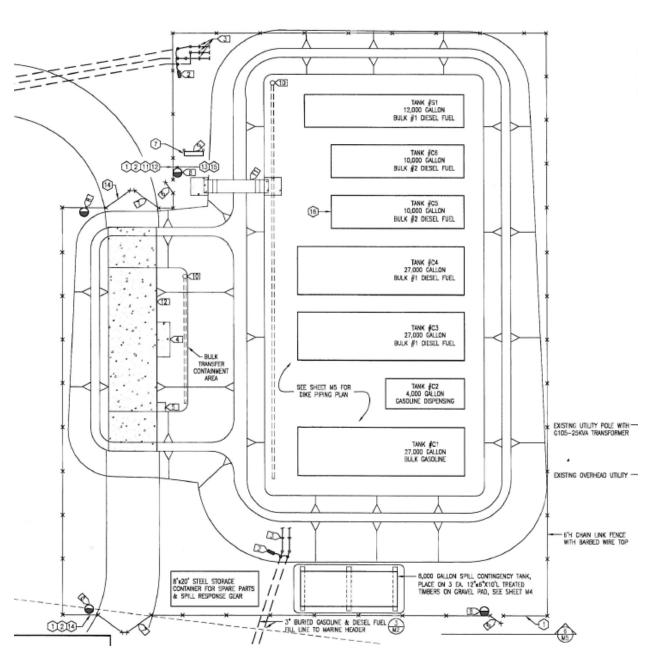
Nikolai Bulk Fuel Facility Tank Layout
